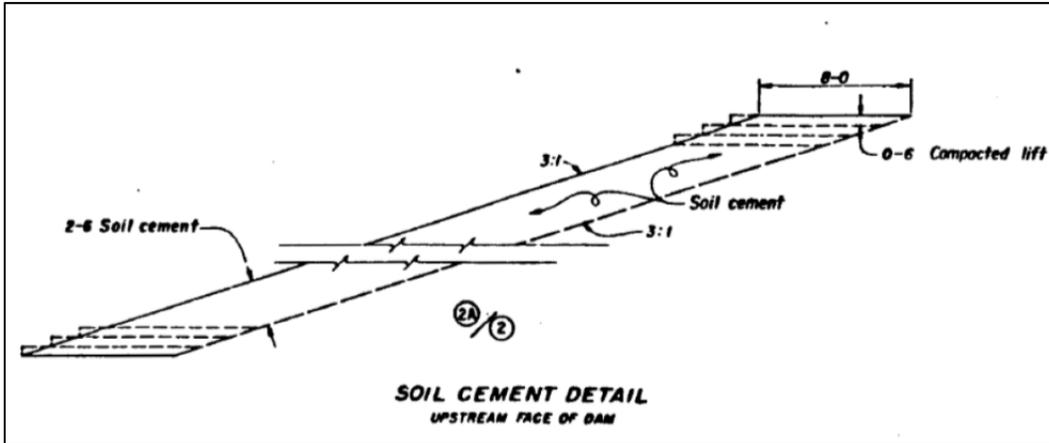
Typical stairstep soil-cement configuration.
